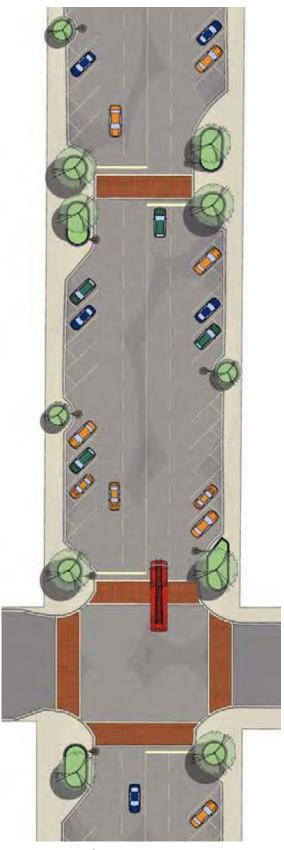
3rd Ave. Streetscape Detail Plan
